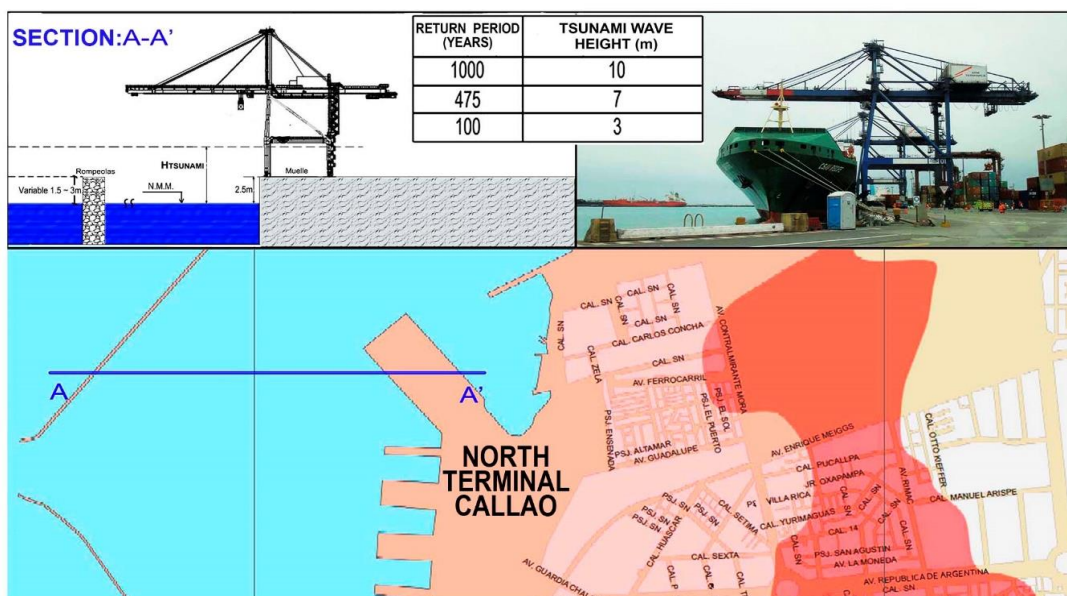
Tsunami wave height and cross section of North Terminal (Source DRPINT SAC)
